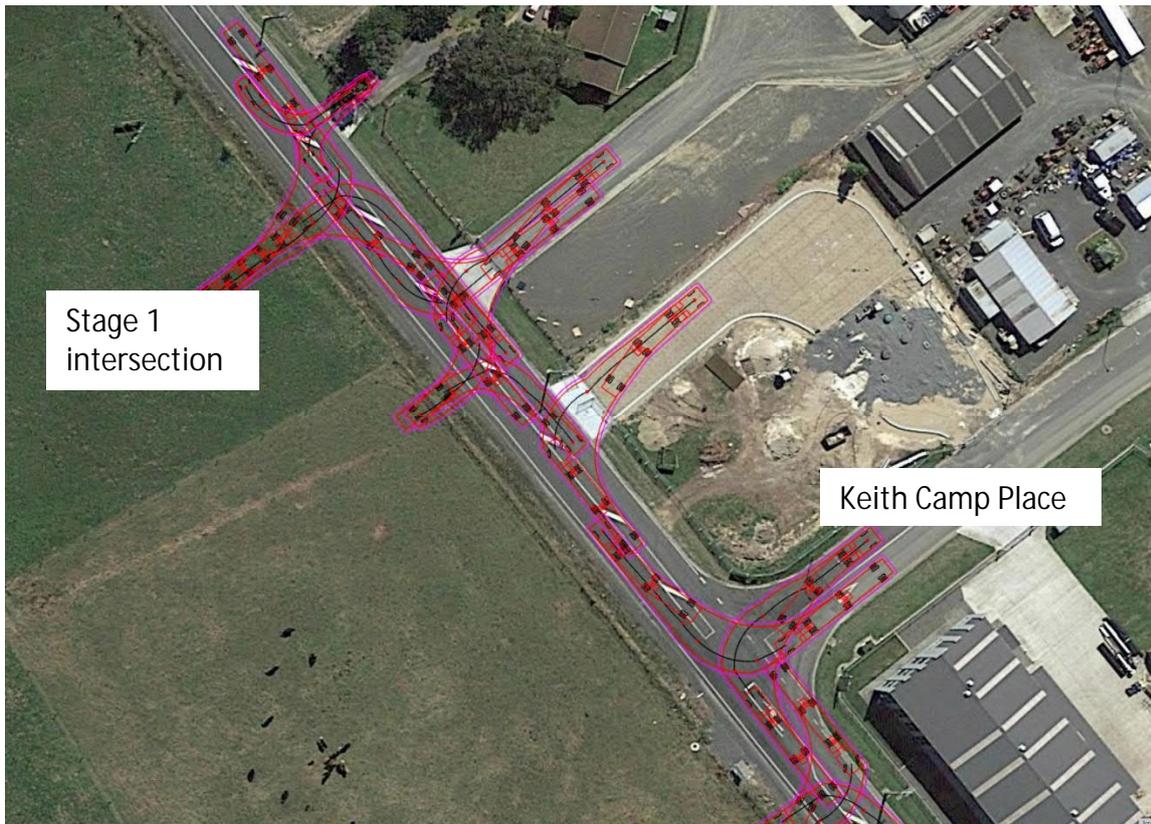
Avenue Road North pedestrian assessment –Stage 1 intersection to Keith Camp Place
